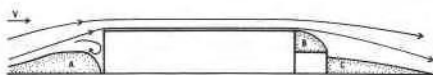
Snow Accumulation on Multilevel Flat Roofs
